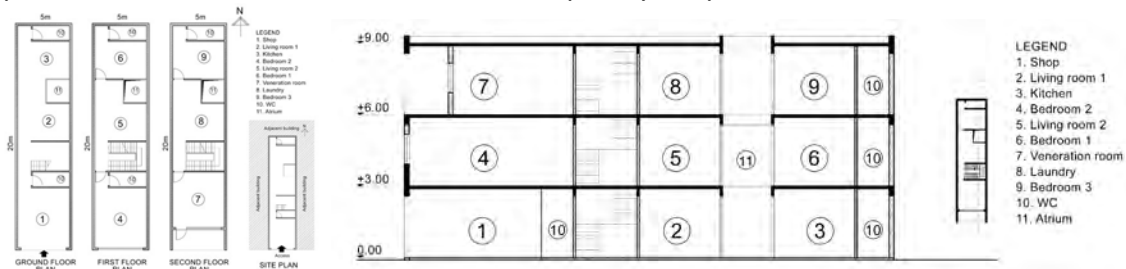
Floor plans, site plan, and longitudinal section of the typical contemporary shop-house
